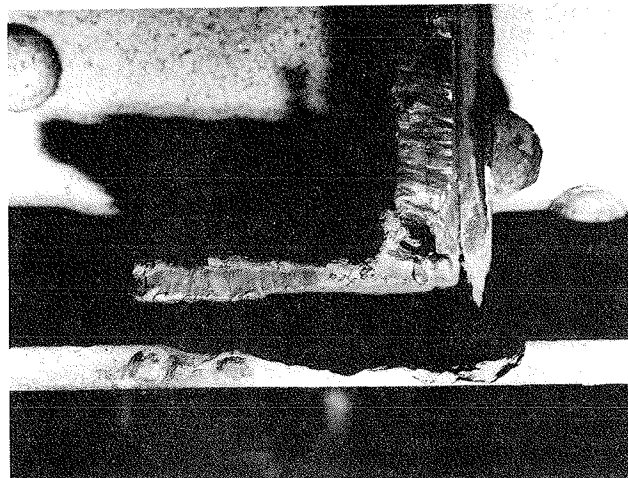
Flange angle corrosion at cross-frame connections.
